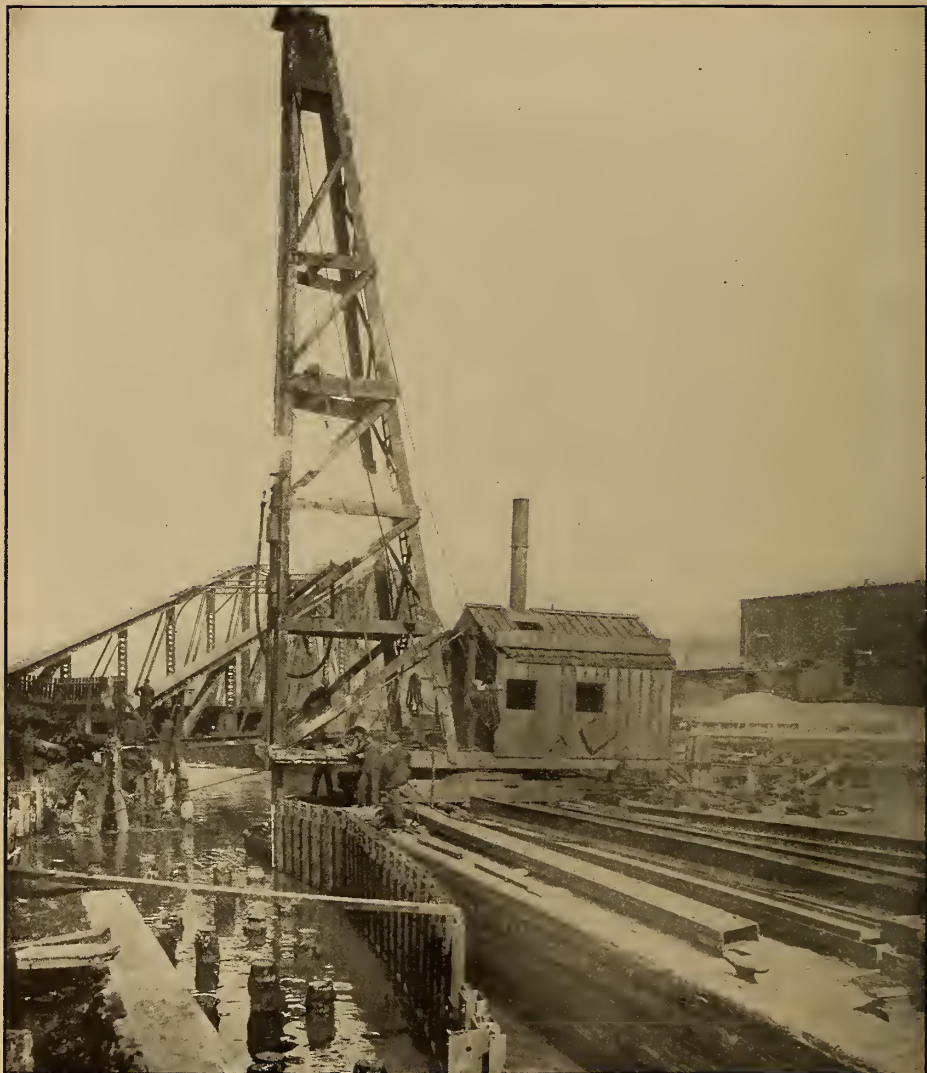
COFFER DAM AT KINZIE STREET BRIDGE, CHICAGO. JACKSON SHEET STEEL PILING
